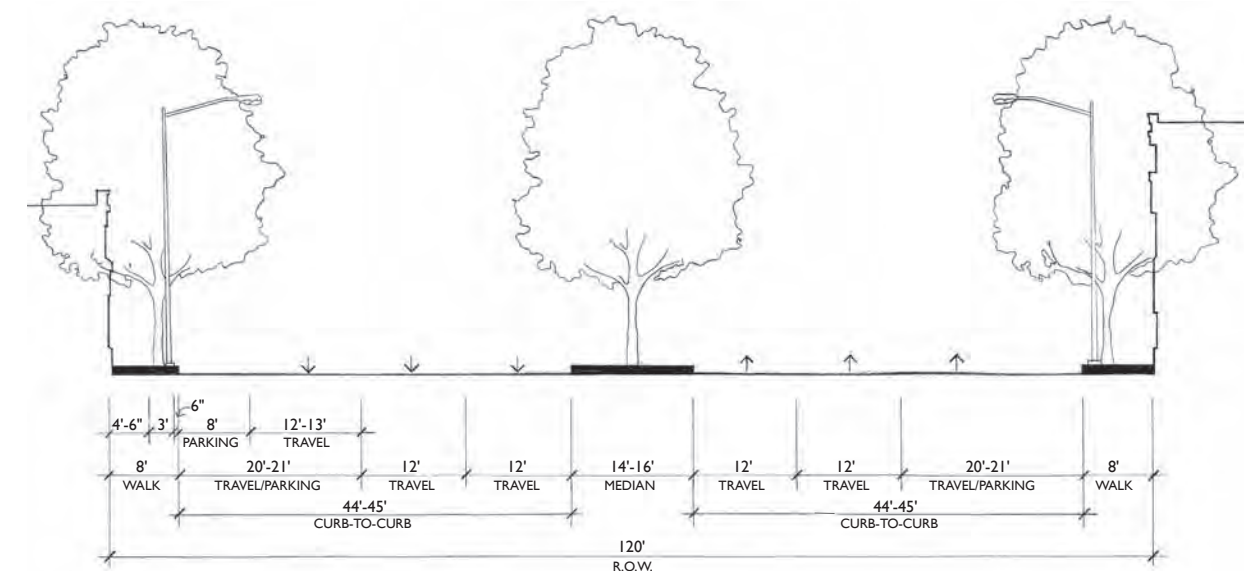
Typical existing 'Urban' 6-Lane cross-section
